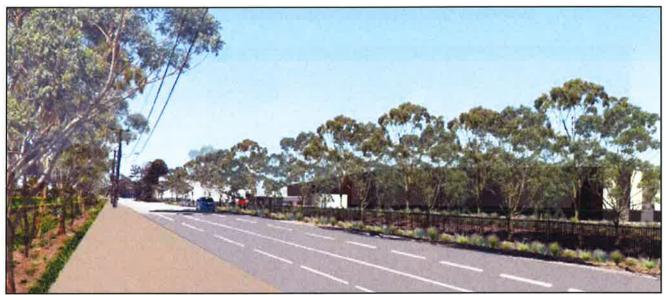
Indicative view looking north-east (Source: Applicant's EIS)
